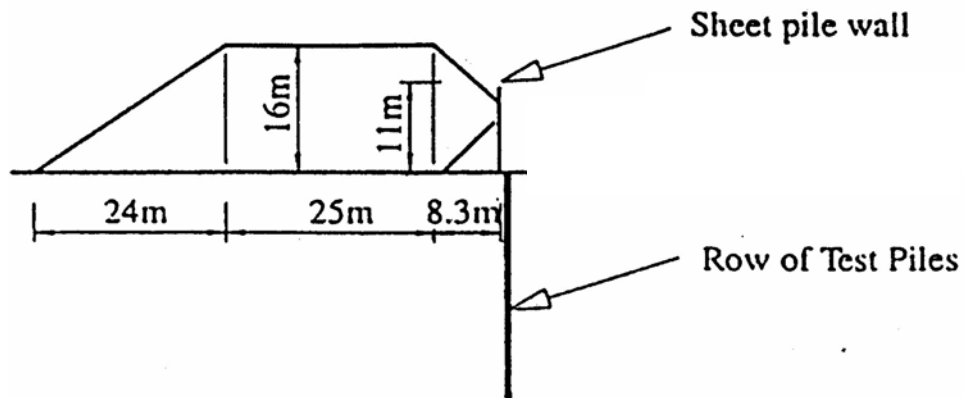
Test set-up at Zelgate, Belgium (after De Beer and Wallays, 1972)
